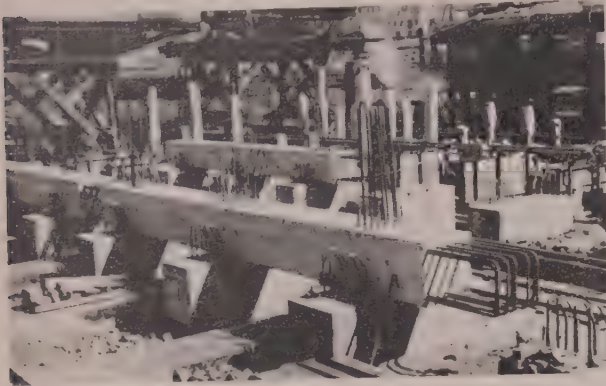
Boulogne Marine Station. Junction of precast concrete beams
